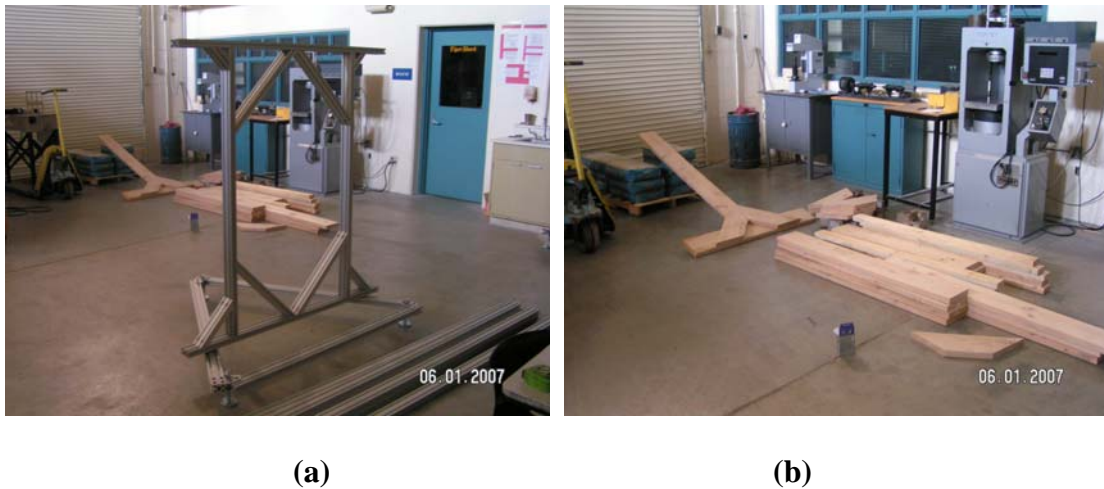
Photographs showing early construction of the (a) aluminum pier and (b) wooden abutments.
